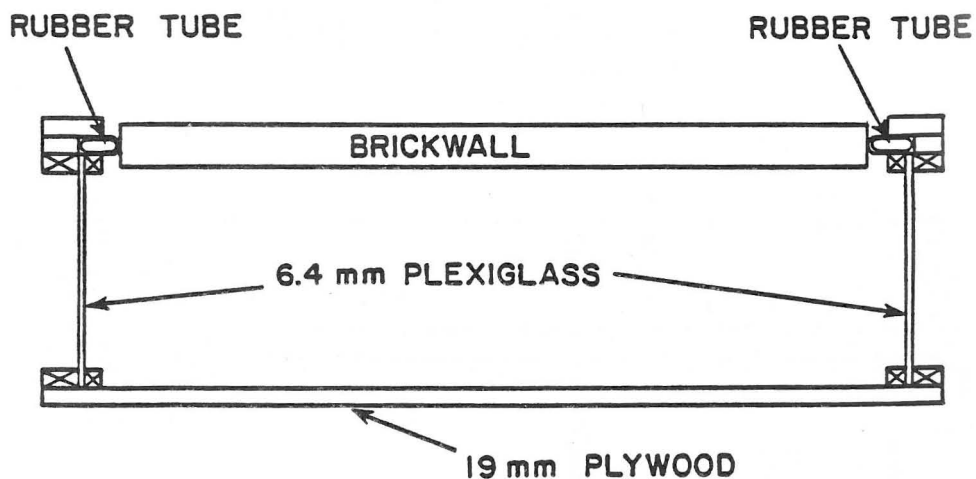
Cross Section Through Brick Wall and Lateral Loading Chamber Illustrating Inflatable Rubber Tube
